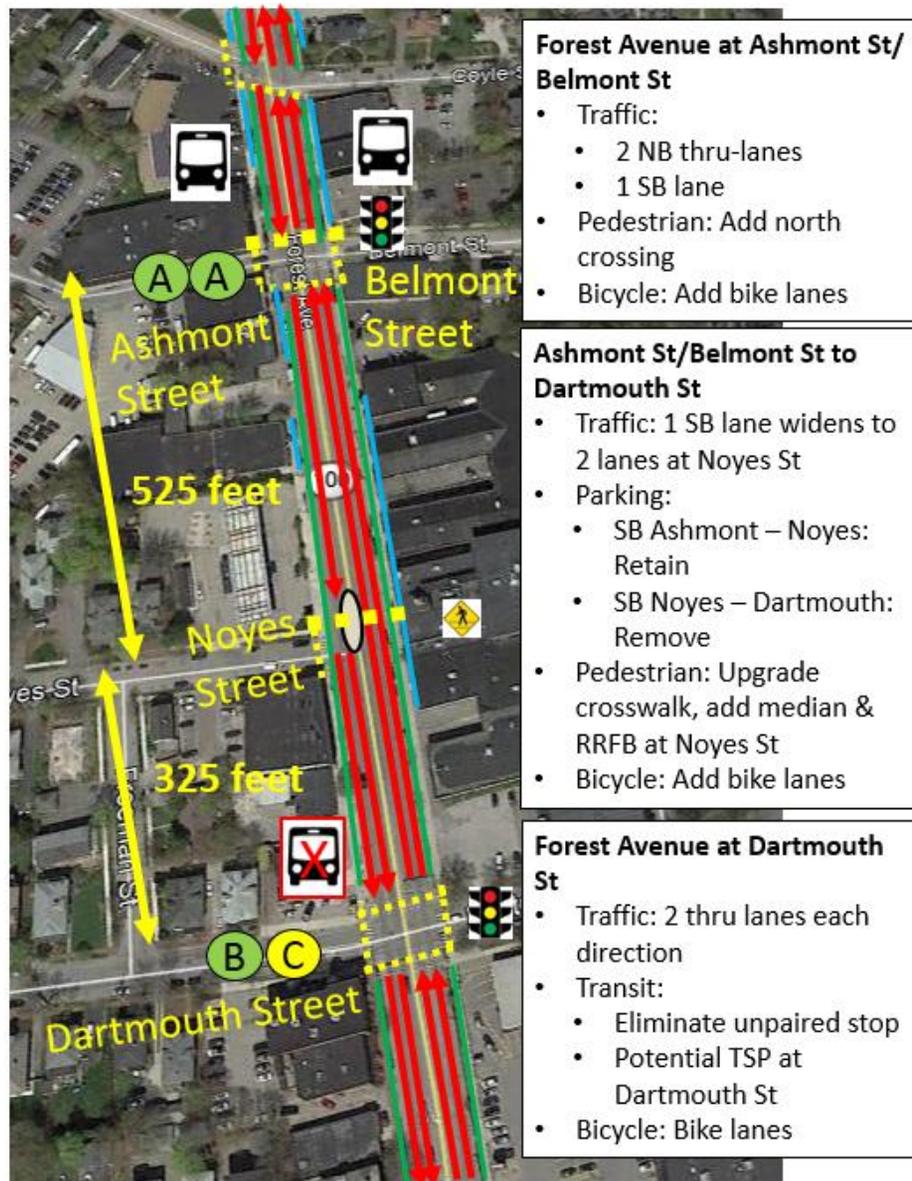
Ashmont Street/Belmont Street to Dartmouth Street – Alternative 1
